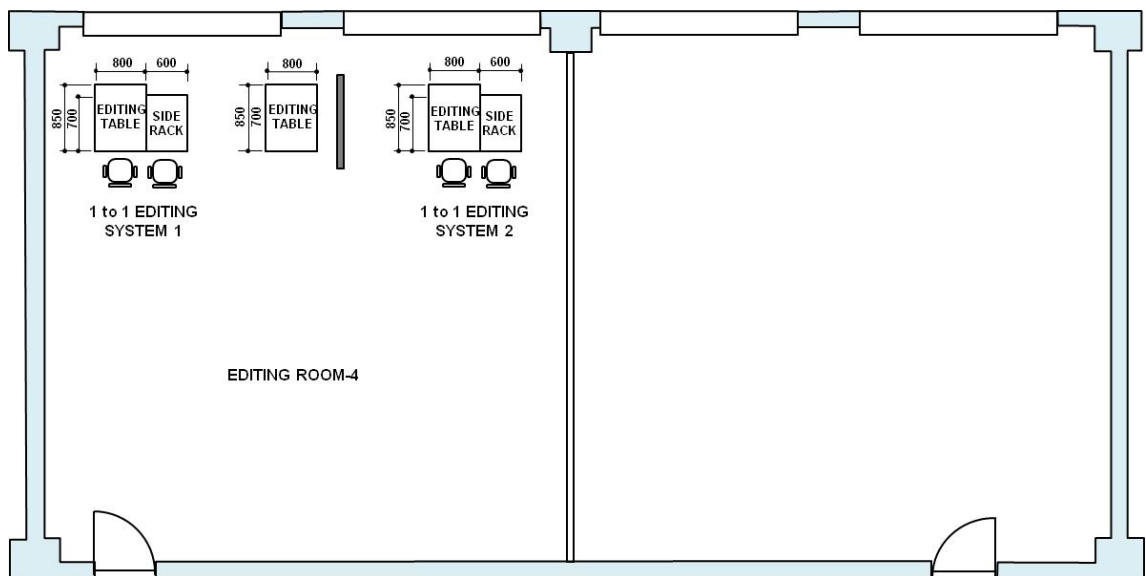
Equipment Arrangement of Editing Room-4
